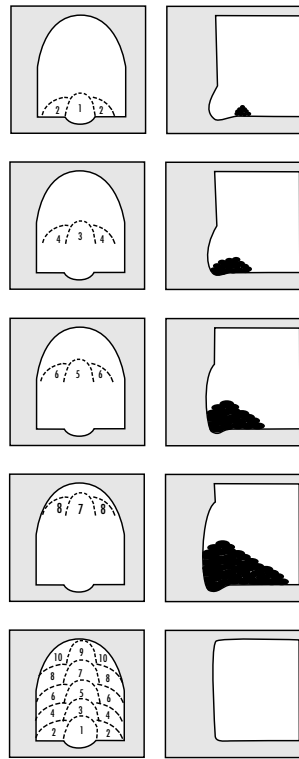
47. Hammer working sequence from floor to roof.
